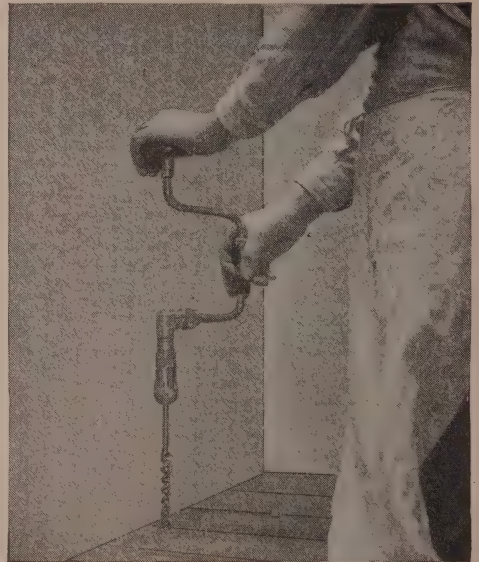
Boring Hole with Ratchet Brace in Floor near Wall
